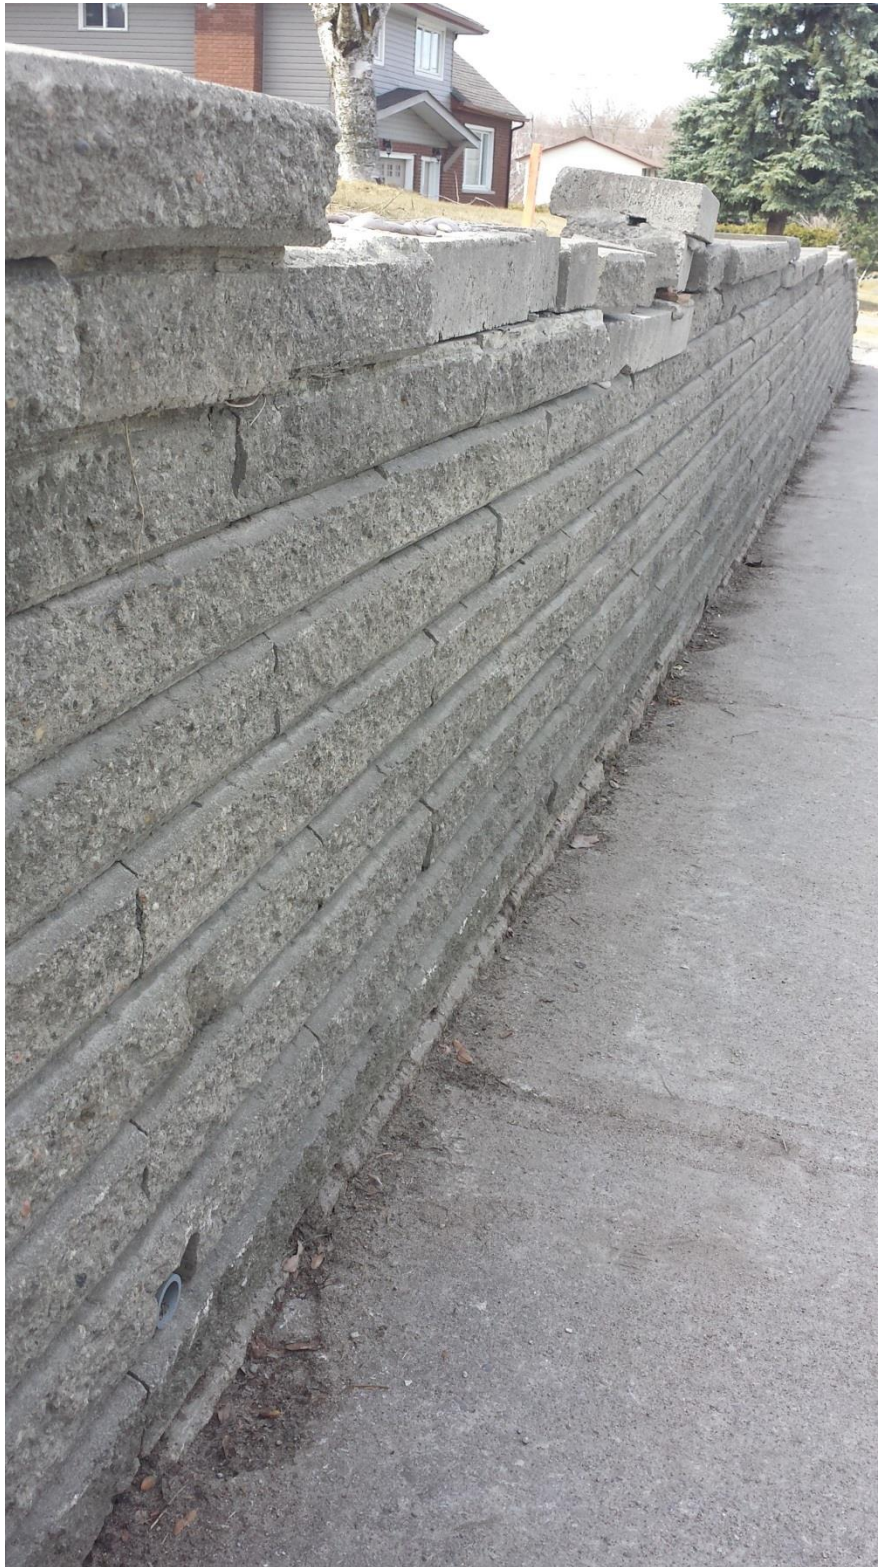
Taken near the east end of the Ottawa Street retaining wall, facing northeast. (May 13, 2015)
